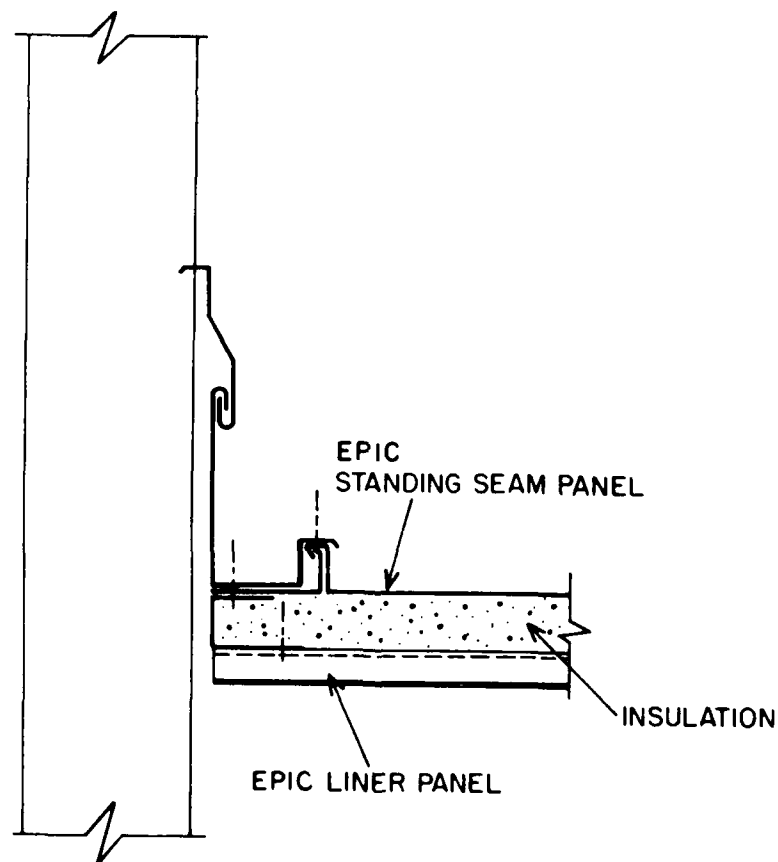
Metal flashing with slipjoint at sidewall example 2.
